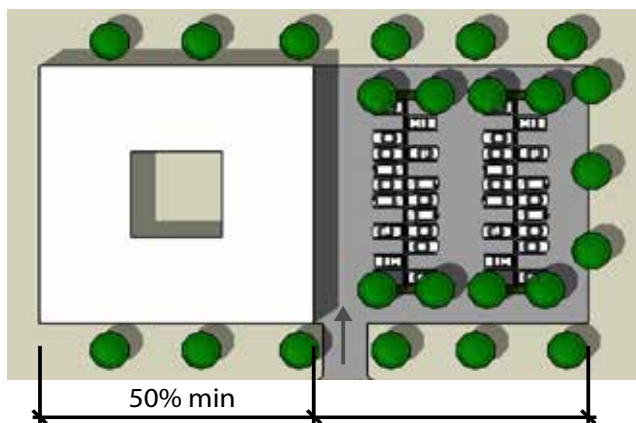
S1.a Minimum street frontage for buildings without a central courtyard opening to the street.
